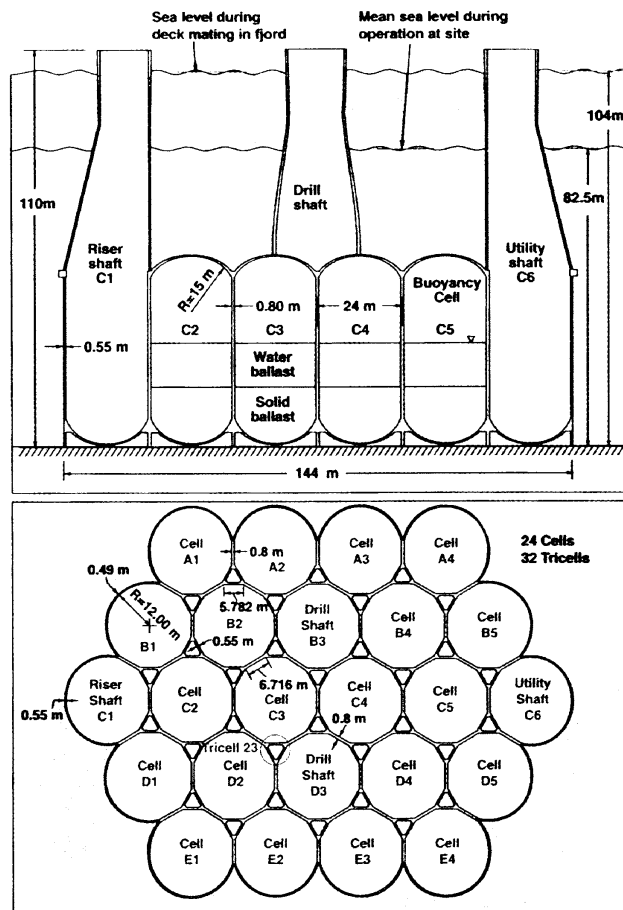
Geometric details of the Sleipner concrete base structure.
